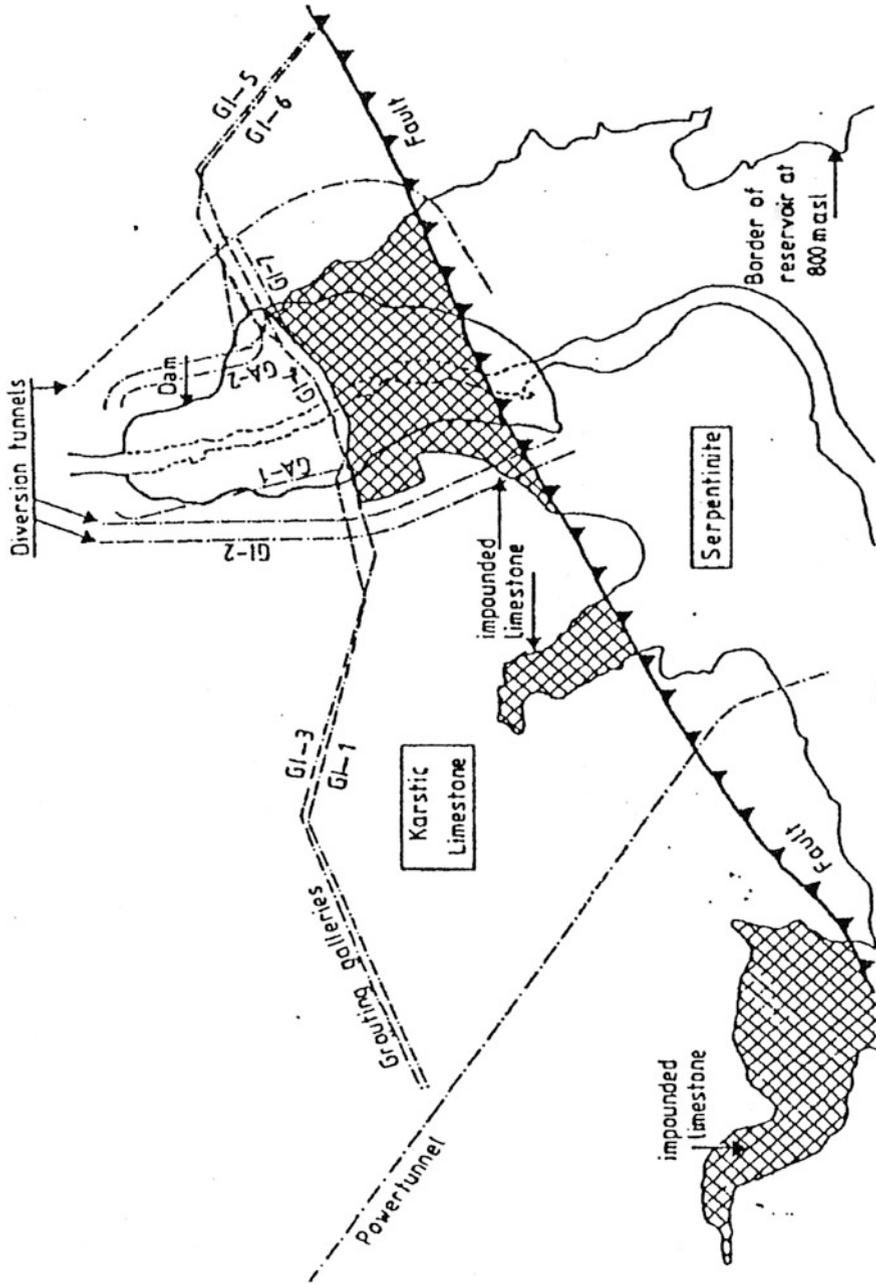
Pueblo Viejo Dam. Main fault. Areas of limestone impounded. Diversion tunnels, inspection and grouting galleries
